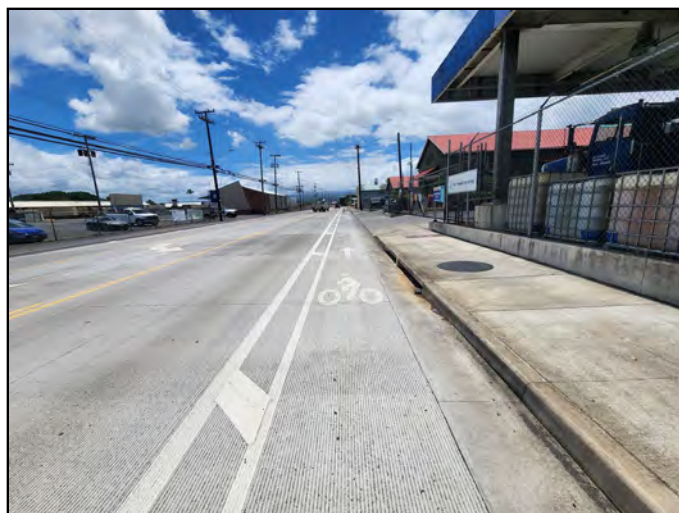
Kalaniana'ole Street New Sidewalk (Makai Side)
